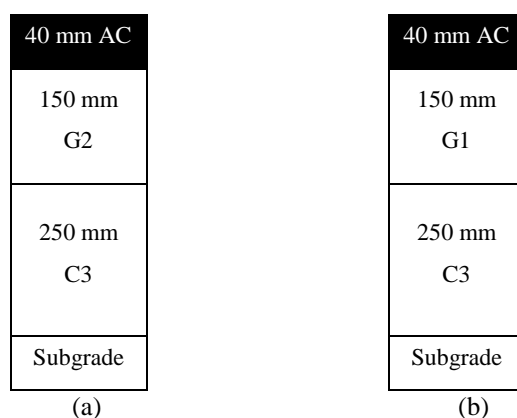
Pavement Structure 1 (a) and Pavement Structure 2 (b)
